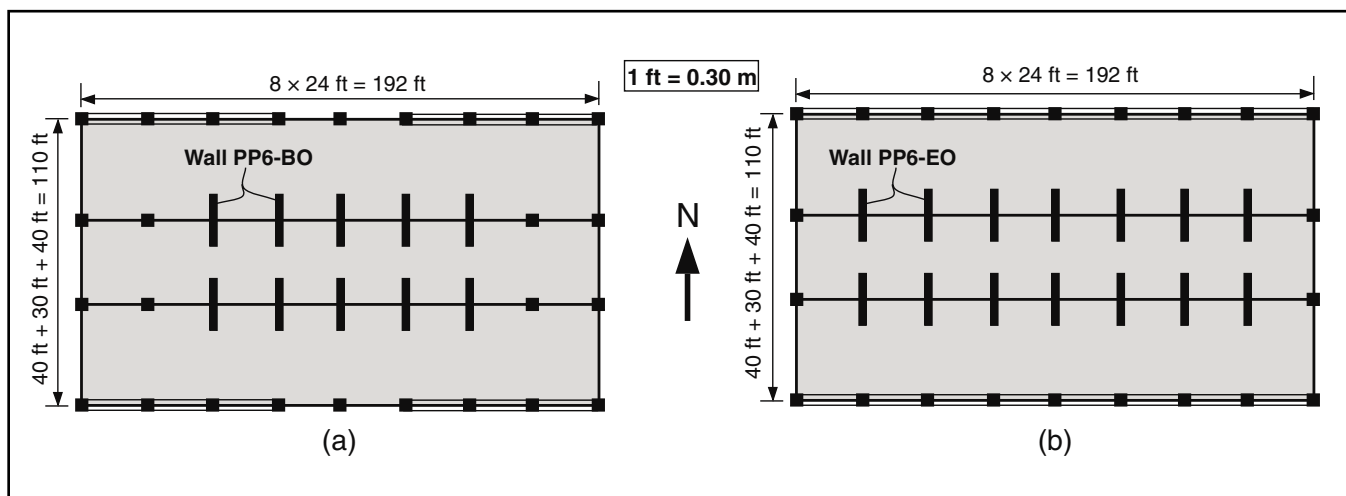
Plan view of prototype buildings: (a) Building PP6-BO; (b) Building PP6-EO.
